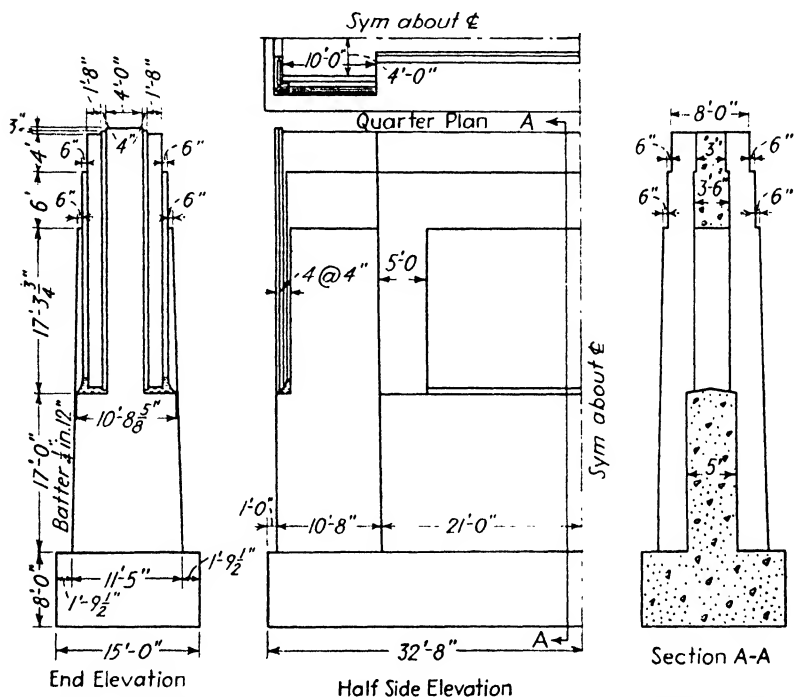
Reinforced-concrete Double-shaft Pier for Bridge in Charleston, W. Va. (Courtesy of C. P. Fortney, Consulting Engineer.)
